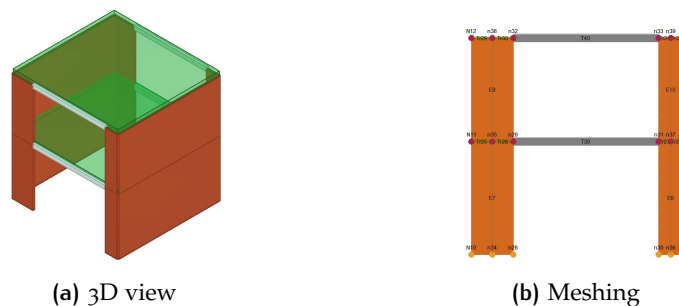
Model 1 with reinforced concrete beam as connecting element.
